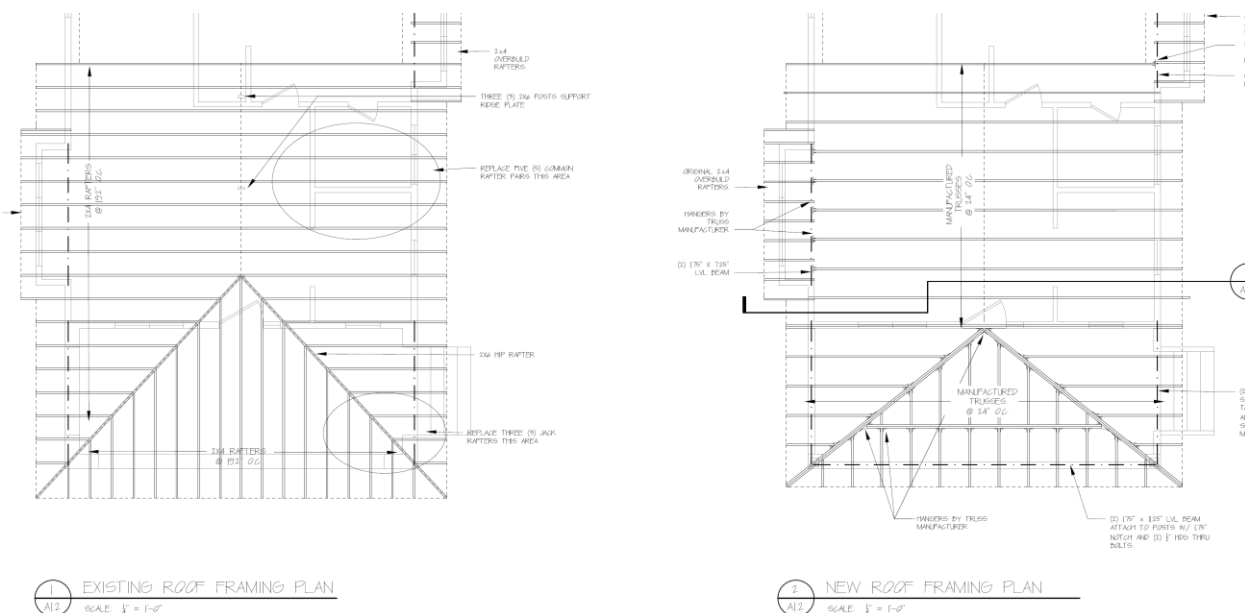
Roof framing showing the existing (left) and the proposed (right) and the intersection of the roof planes.
